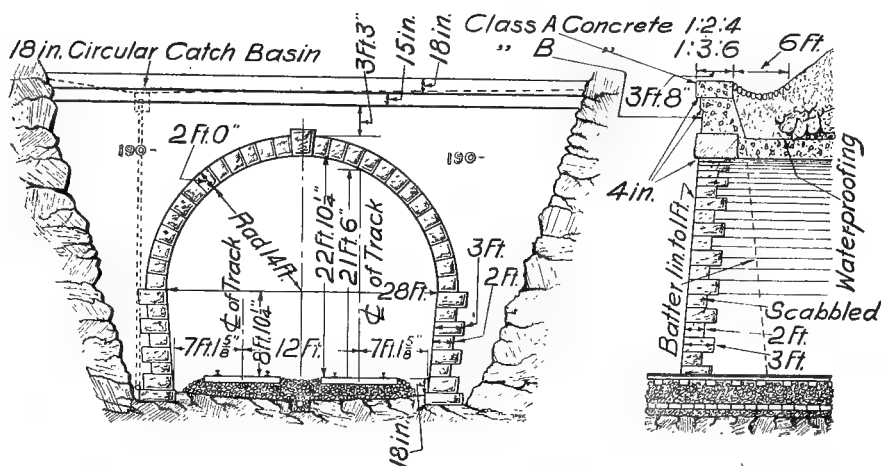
STANDARD DOUBLE-TRACK TUNNEL FACADE, N. Y. C. & H. R. R. R.
